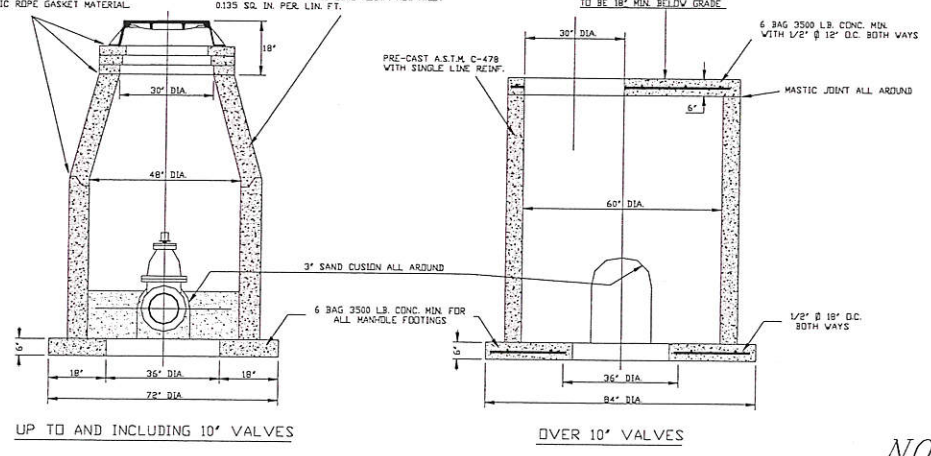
DETAIL OF WATERVALVE MANHOLE FRAME & COVER
